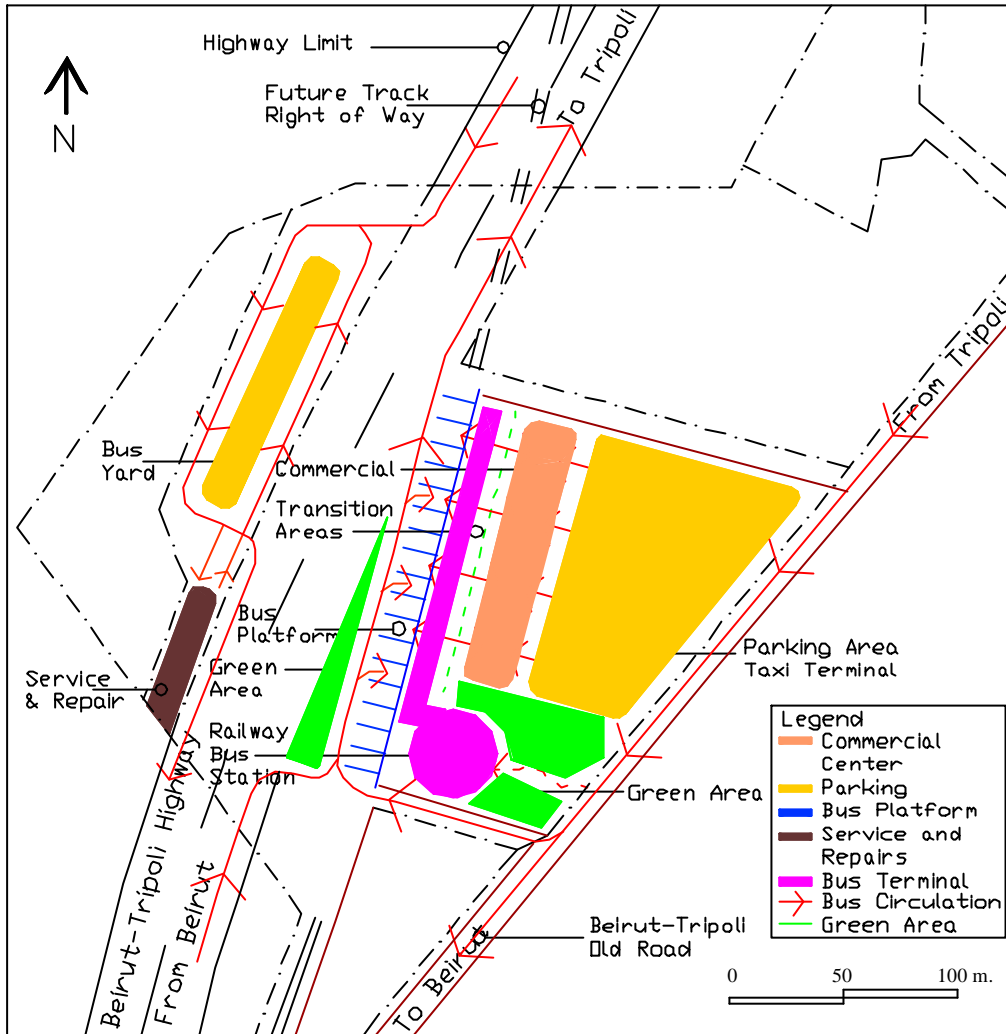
Proposed Terminal Layout by Previous Study
